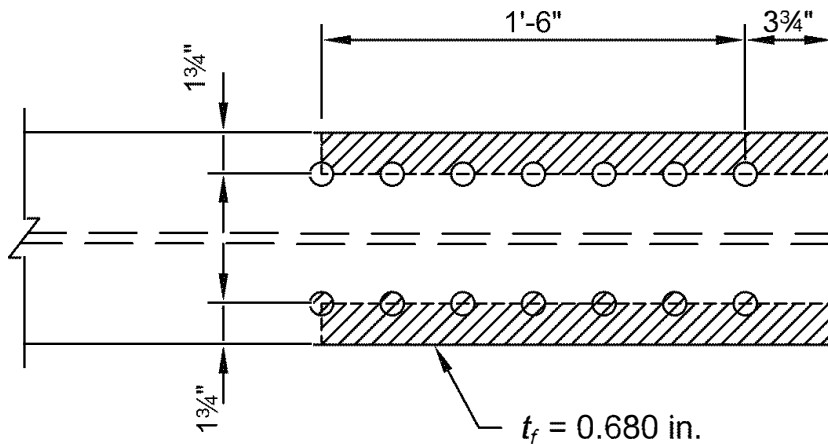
U-shaped block shear failure path on beam flange.
